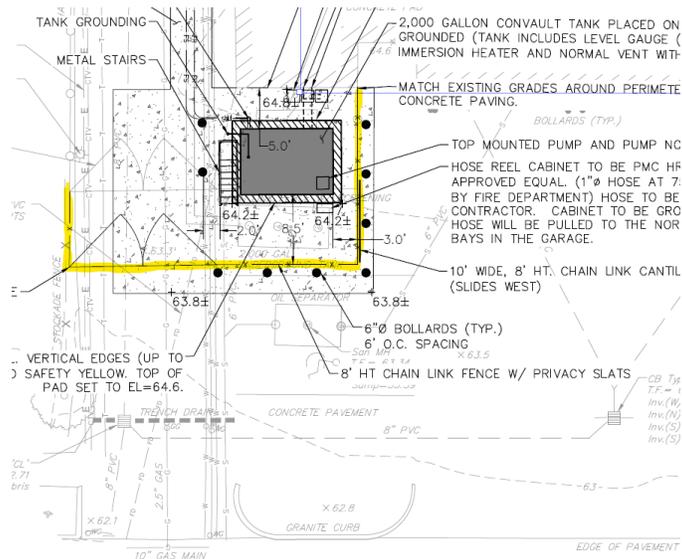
Site plan excerpt showing location of proposed fencing highlighted – Freeman Companies 2022
